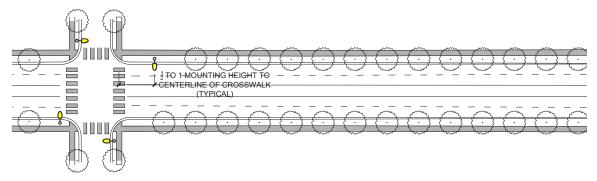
Typical Collector with Street Lighting at Intersections Only Plan
